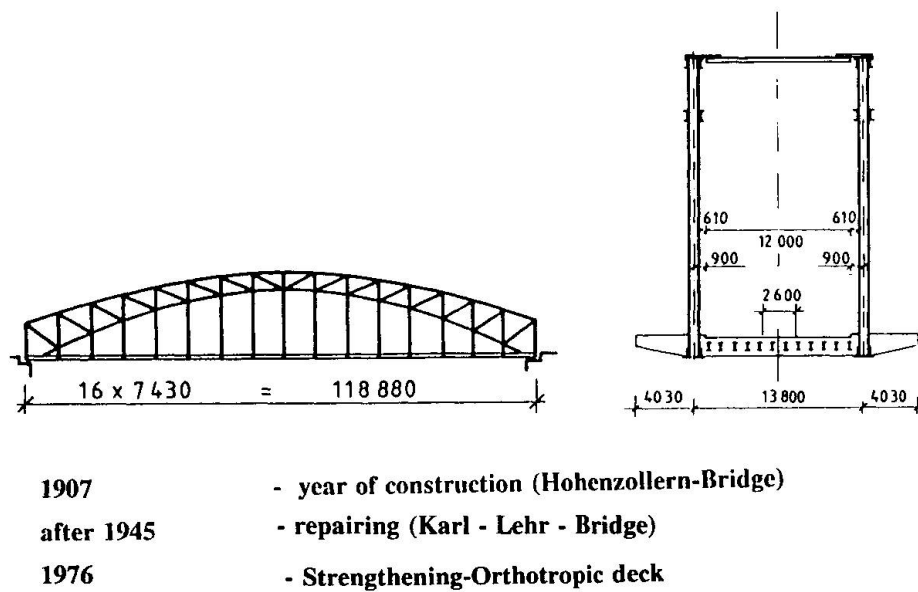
Structural system and cross-section of the Karl-Lehr-Bridge
